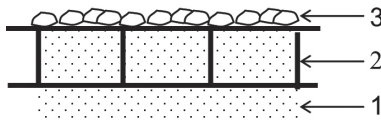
Structure of road pavement with polyethylene geocell. (1) Subgrade soil; (2) Geocell filled with sand; (3) Protective aggregate layer.
